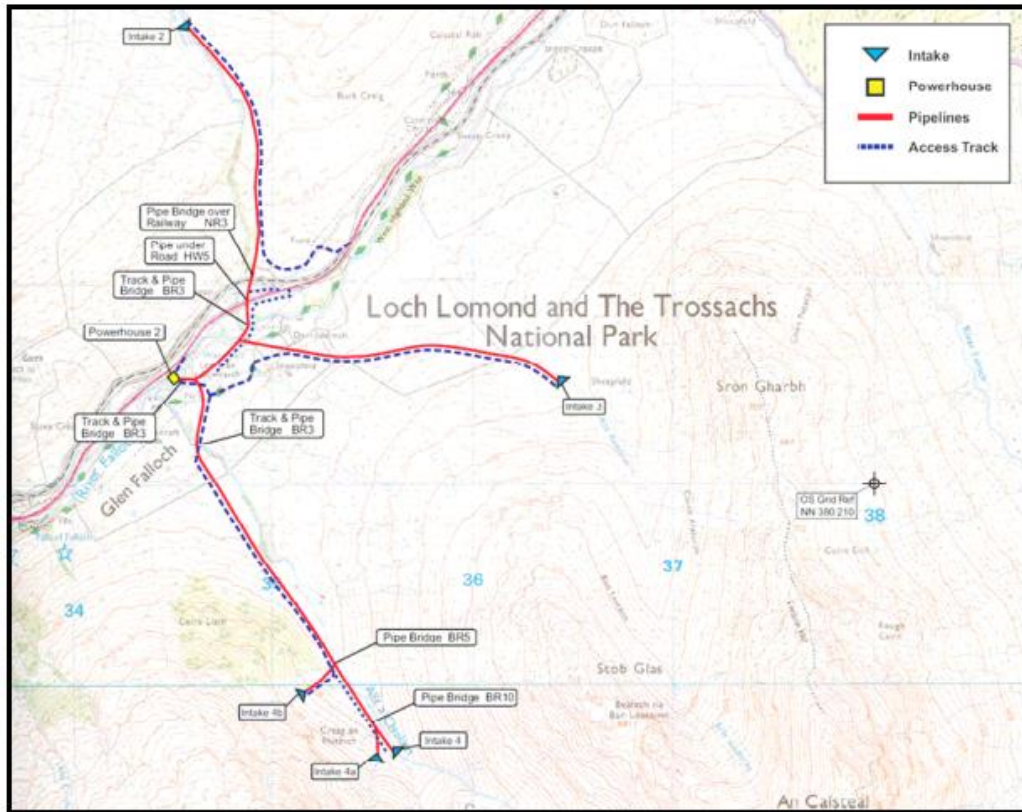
Derrydarroch hydro scheme site plan (Hydroplan UK, 2009a: p.2)
